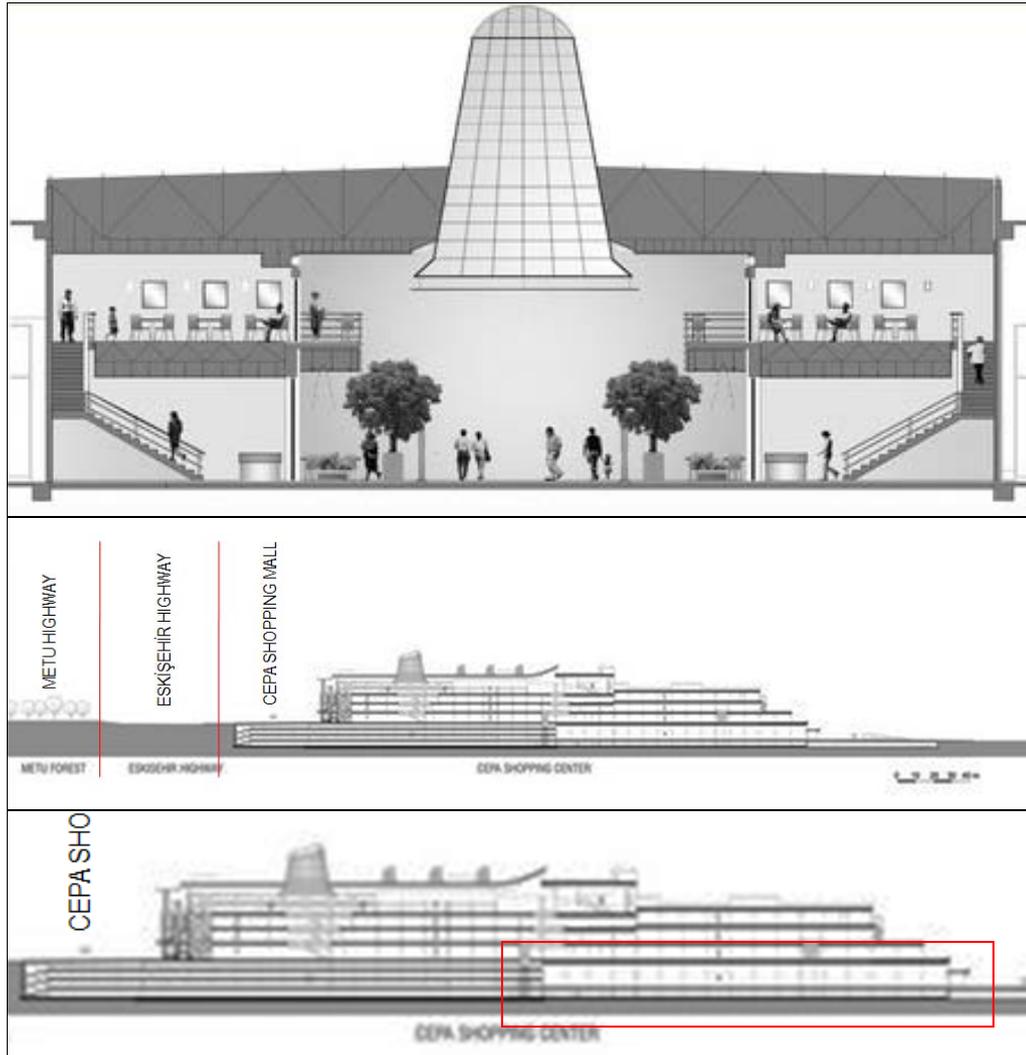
CEPA Shopping Mall – Coffee Street (3rd floor) and Building Sections
